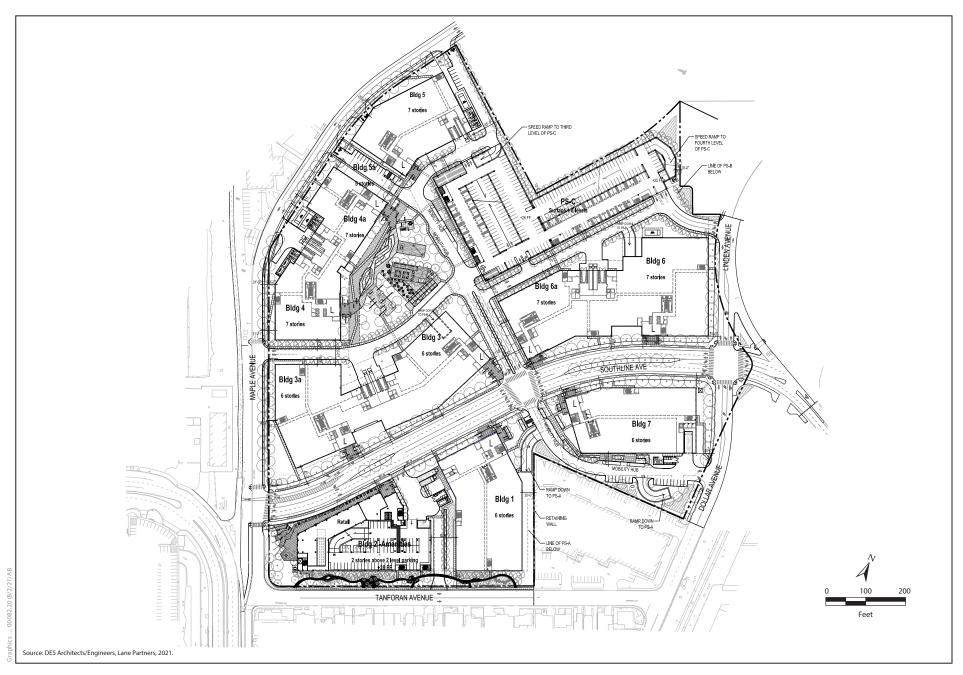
No Intersection Alternative Conceptual Site Plan
